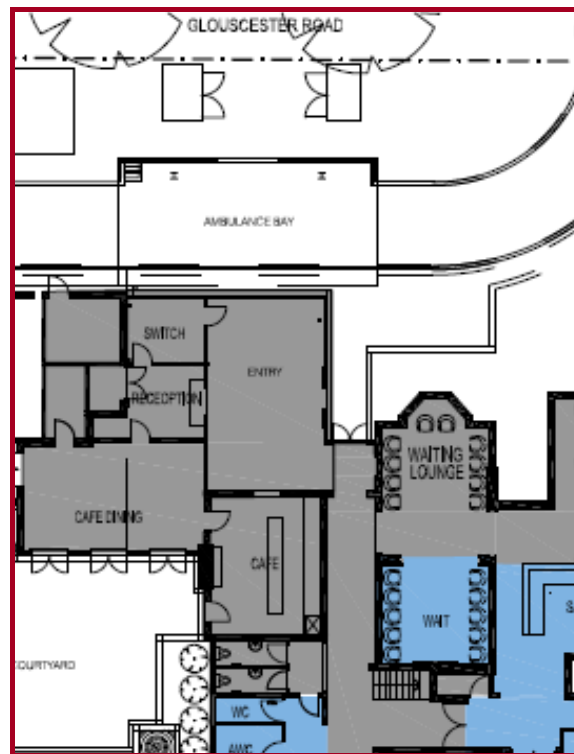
Part of Proposed Ground Floor Plan - Stage 1, DA 033-F showing the proposed new waiting room (in blue) that will connect with the existing waiting lounge in the ground floor room with the bay window. North is oriented to the left of the plan.
